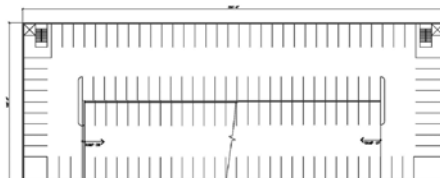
Memorial Shopping Plaza: Land Consolidation Parking Lot & Garage Scheme C (Blocks 608)
